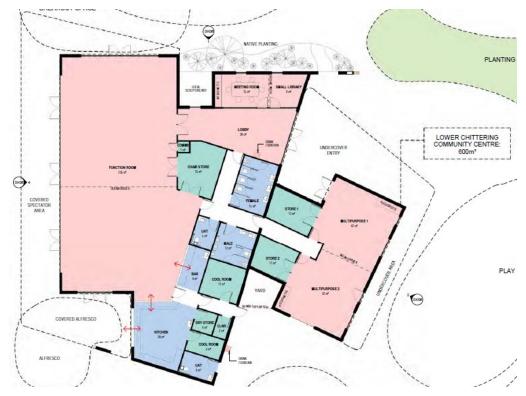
LOWER CHITTERING COMMUNITY HALL PLAN
